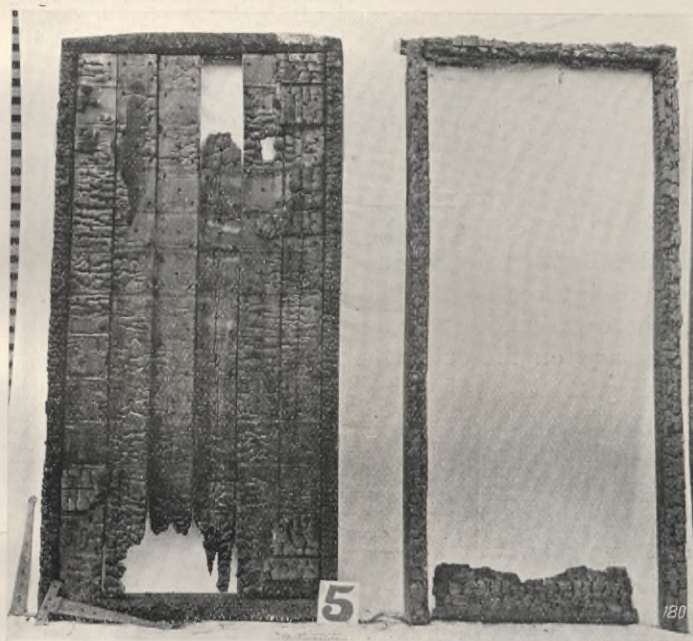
Fig. M VIEW OF DOORS SHOWING CONDITION OF INSIDE AFTER REMOVAL.
